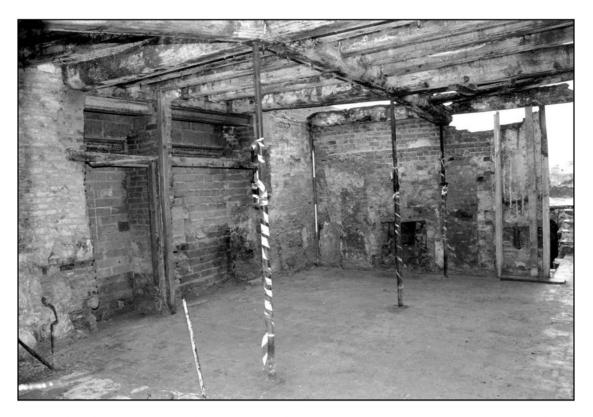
Ground floor main room after clearance, showing fireplaces in north and east walls, looking north-east, February 2004 (photo 3/17)
